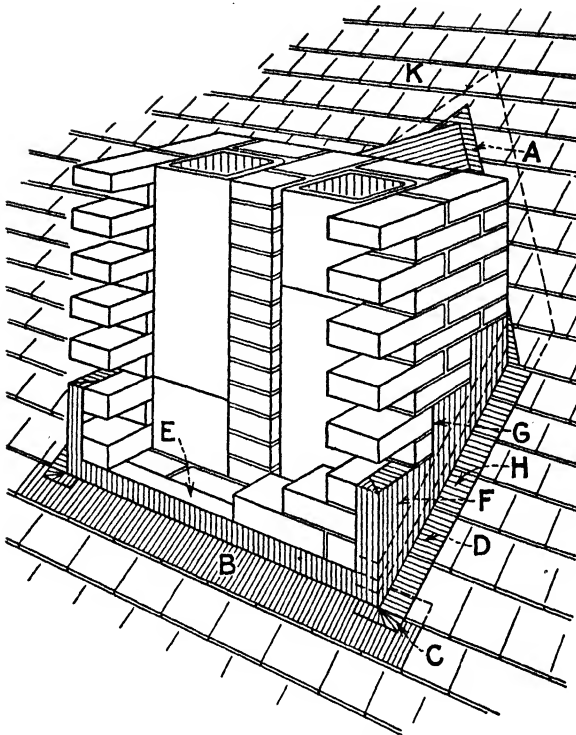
Chimney and roof connection. Sheet metal *A* should have roof units *K* lap over it at least 4 in. Apron *B* bent as at *E*, with base flashings *C*, *D*, and *H* and cap flashings *F* and *G* lapping over the base flashings, provide waterproof construction. When the chimney contains two flues, the joints and the linings should be separated as shown.
